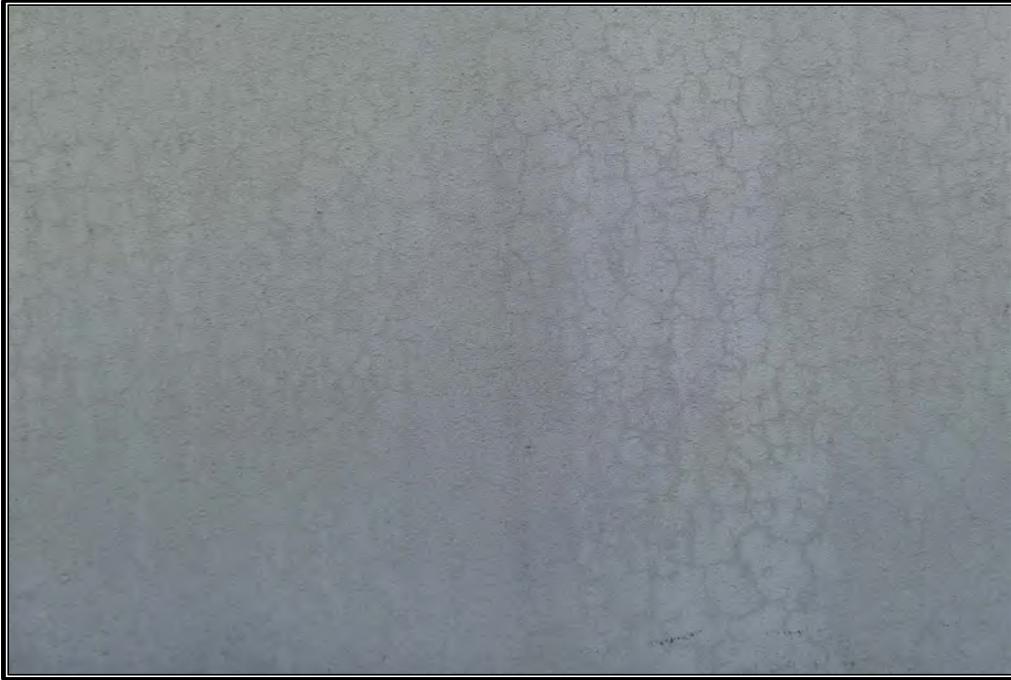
Dakin 2 - Example of Alligator Pattern Cracking observed around reservoir in shotcrete
